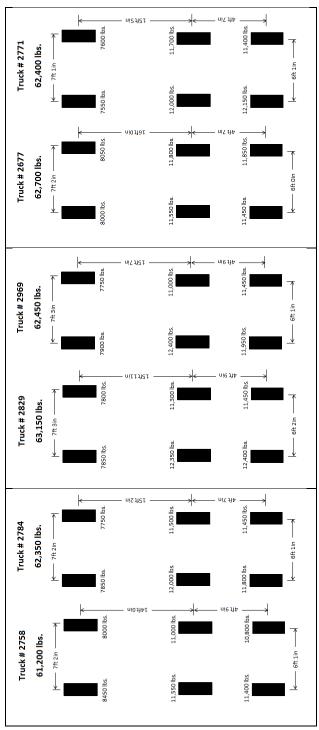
Vehicle layout showing wheel weights: load test 2
